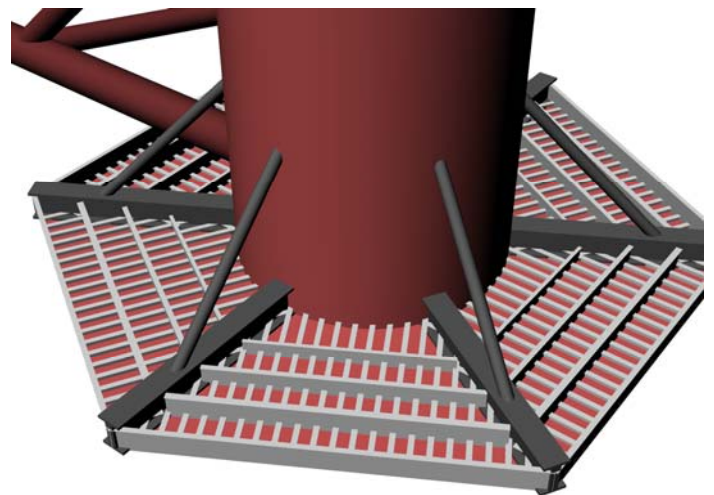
Detail of Structural Reinforcement of Water Entrapment Plate on WindFloat
